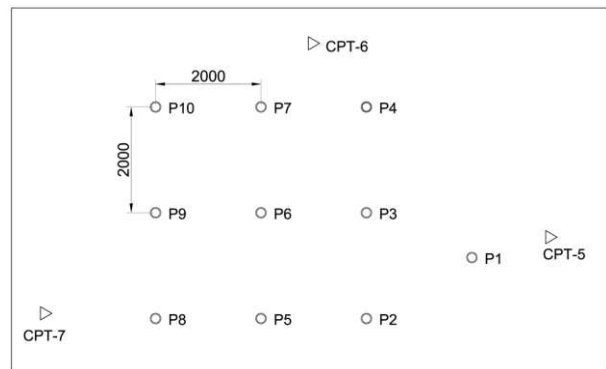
Schematic layout of field tests; Piles P1 to P10 and CPTs 5-7
